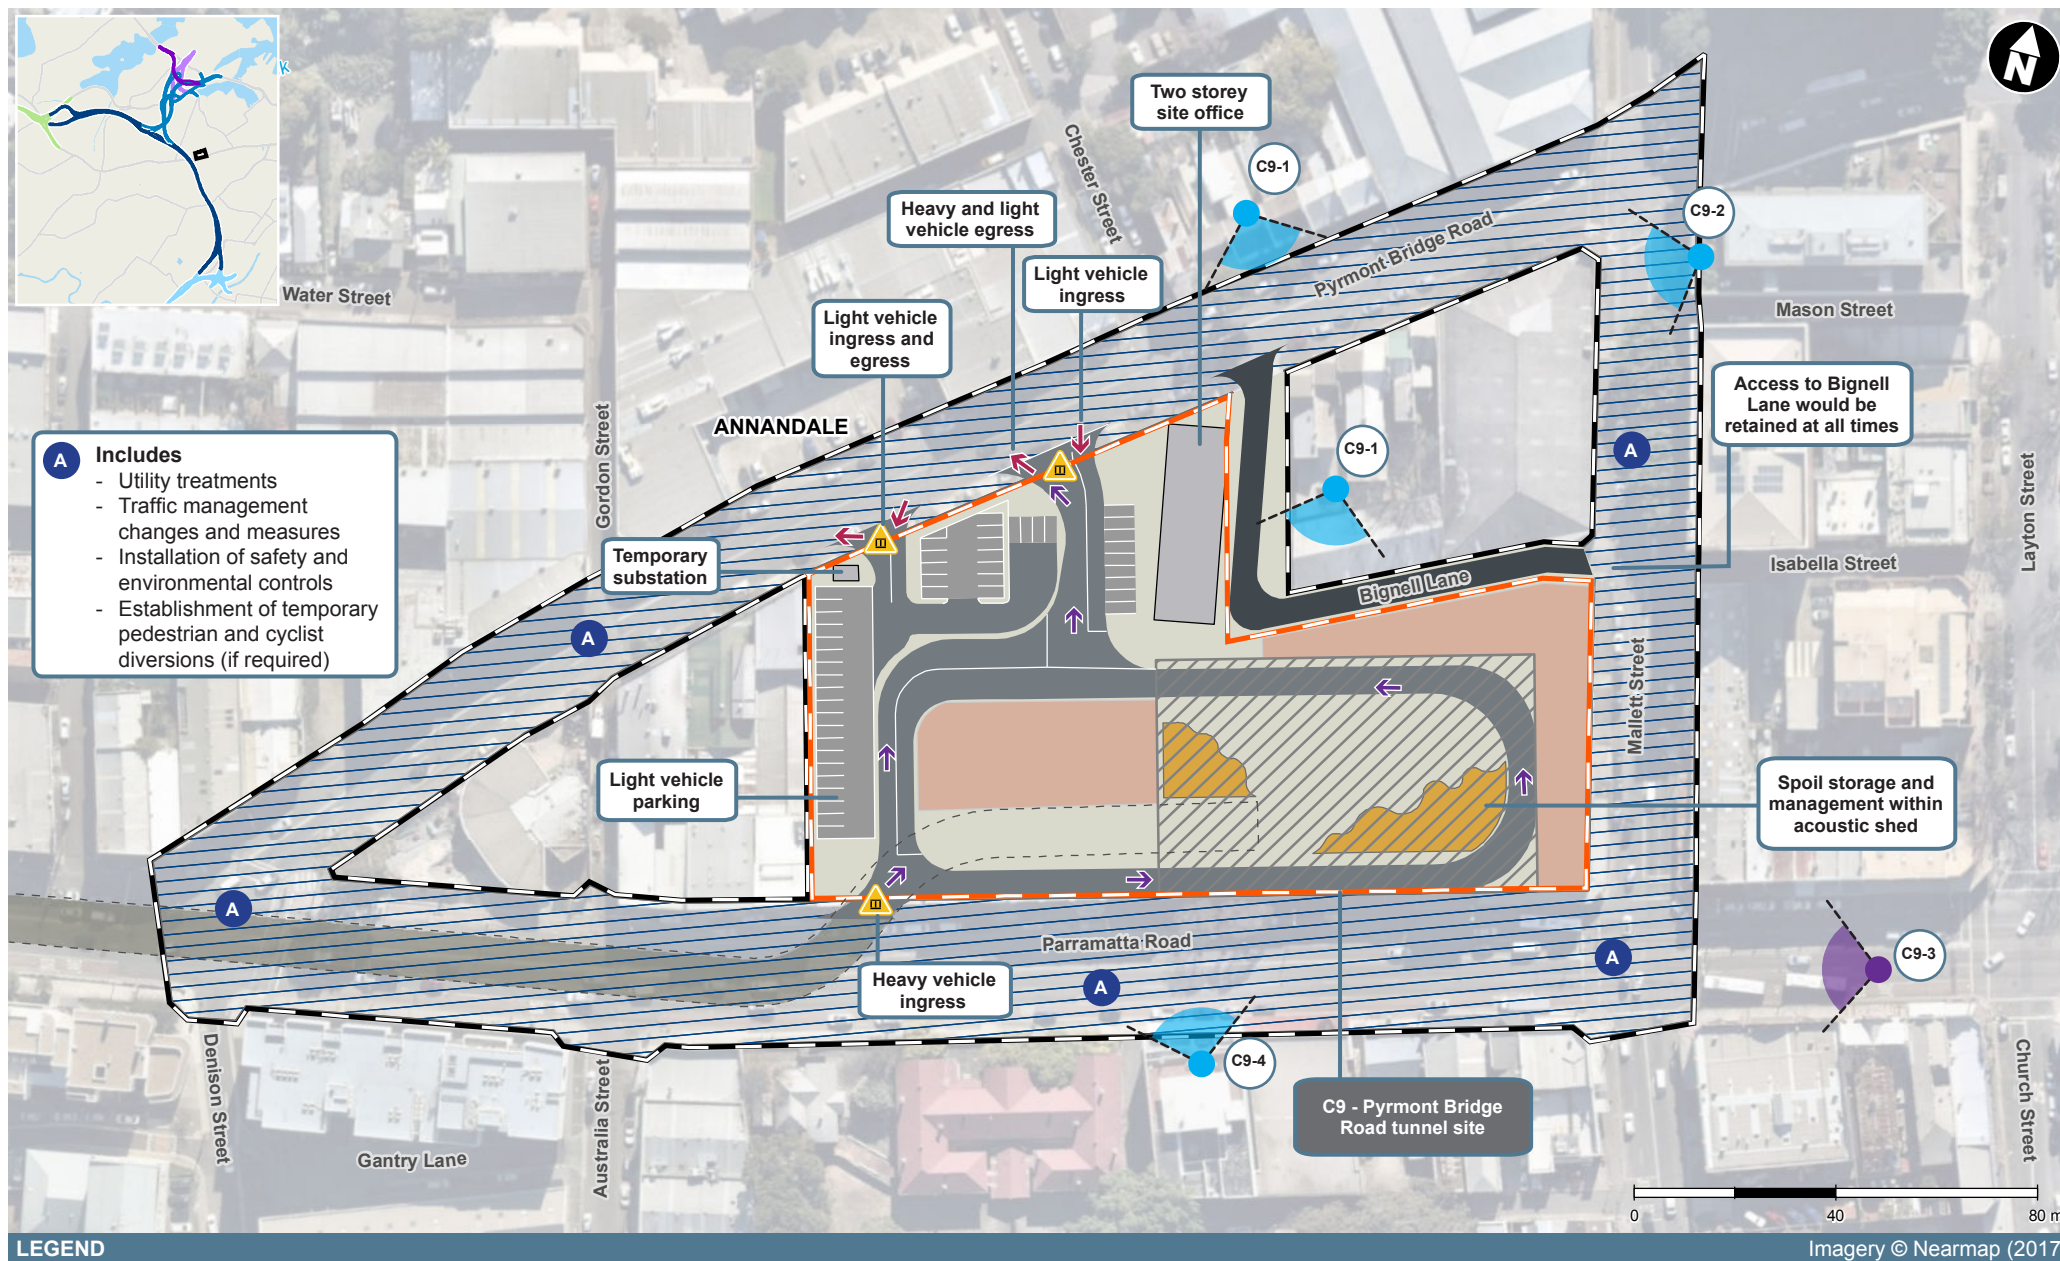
Pyrmont Bridge Road tunnel site (C9) representative receiver locations
